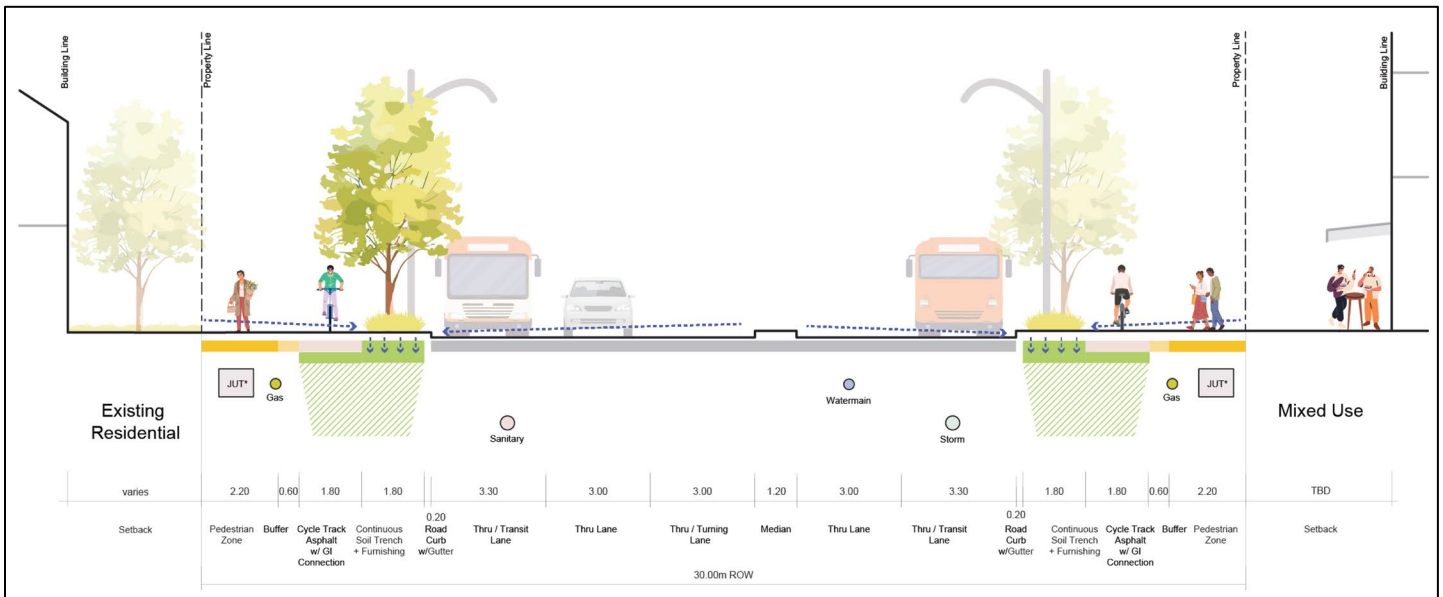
Existing Dufferin Street (Highway 401 to Wilson Avenue) Cross-Section - Option 3
